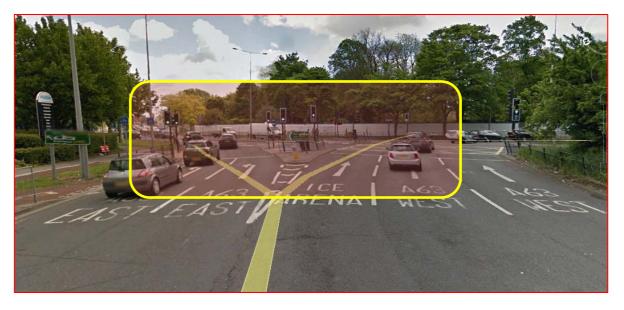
view from Ferensway looking back towards junction with A63 Hessle Road – all street furniture to be removed from central part of intersection of both roads
